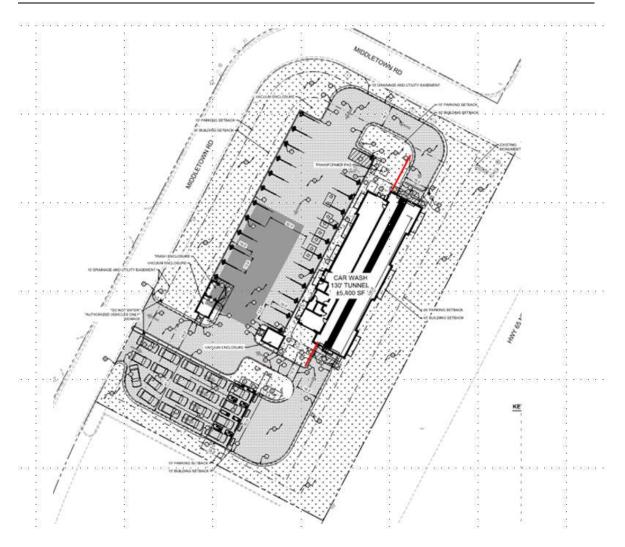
PROPOSED NOISE WALLS ON SITE PLAN
